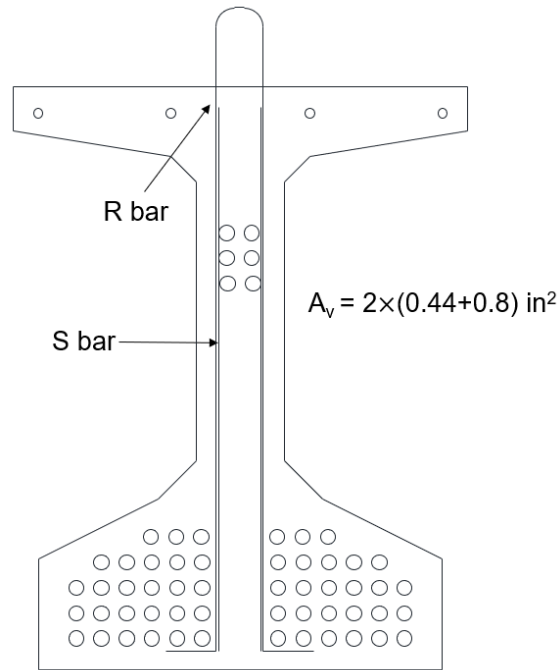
Reinforcement detail and strand layout for the specimens (Tx-46)
